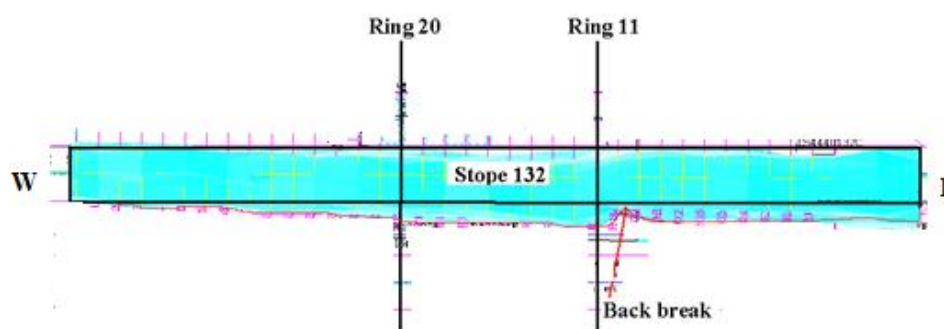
Overbreak and rib failure in stope 132 (plan view)
